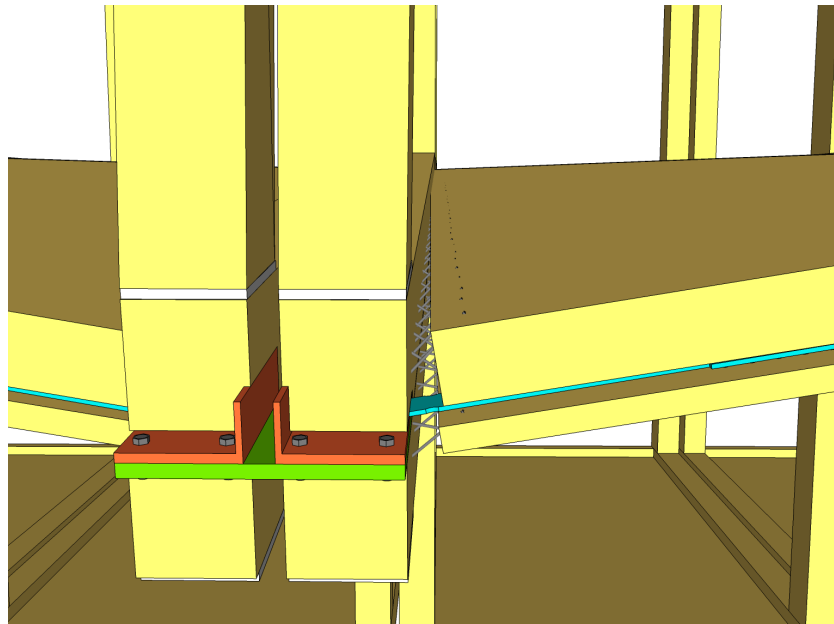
For elongation to occur in the tie plate of the inter module connection, the screwed connection between the floor panel and beam
